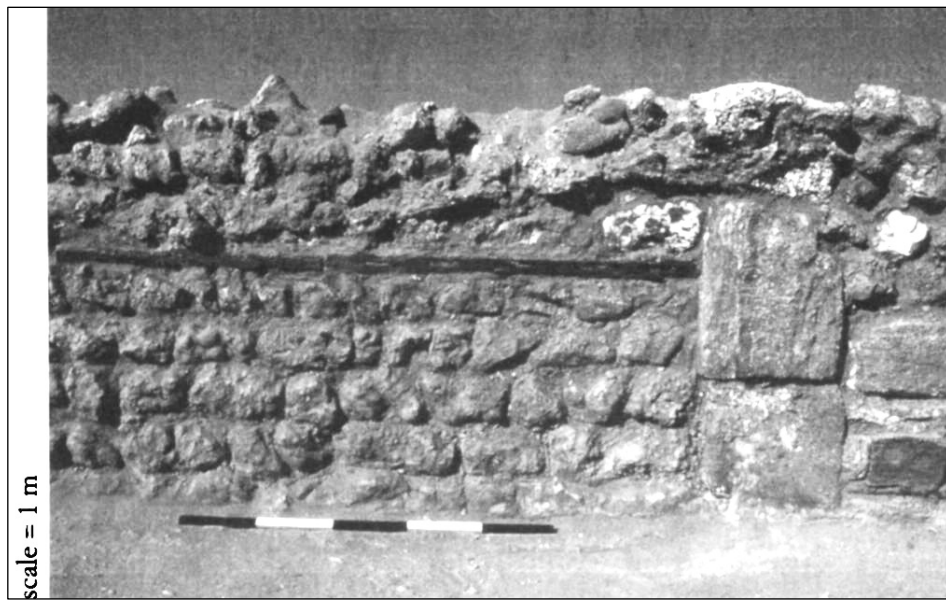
Teakwood reused as levelling course in late Roman wall in trench BE97/98-16. Photograph looking towards south (Source: Sidebotham 2008: 311, Fig. 9).
